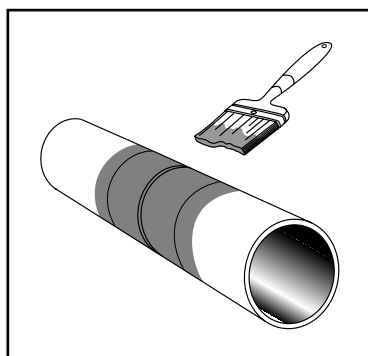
Priming butt welded joints. Apply Denso Primer D to entire area to be wrapped with tape.
